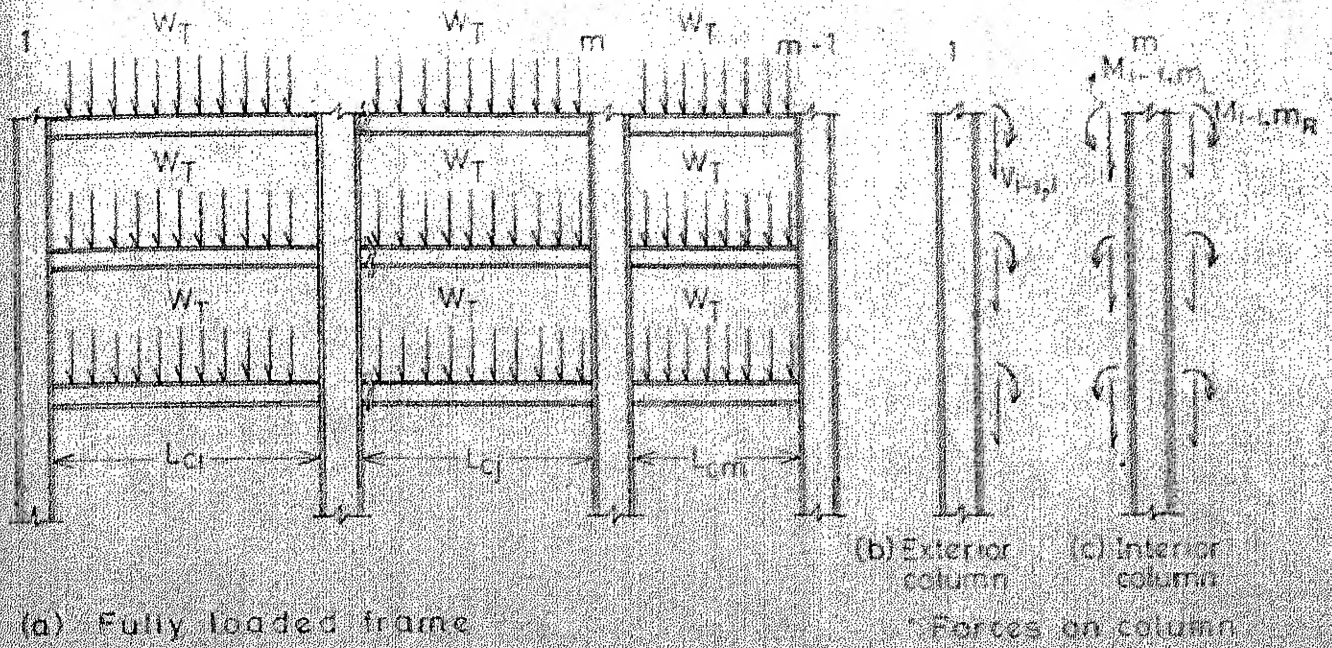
GRAVITY CASE - ALL SPANS FULLY LOADED
